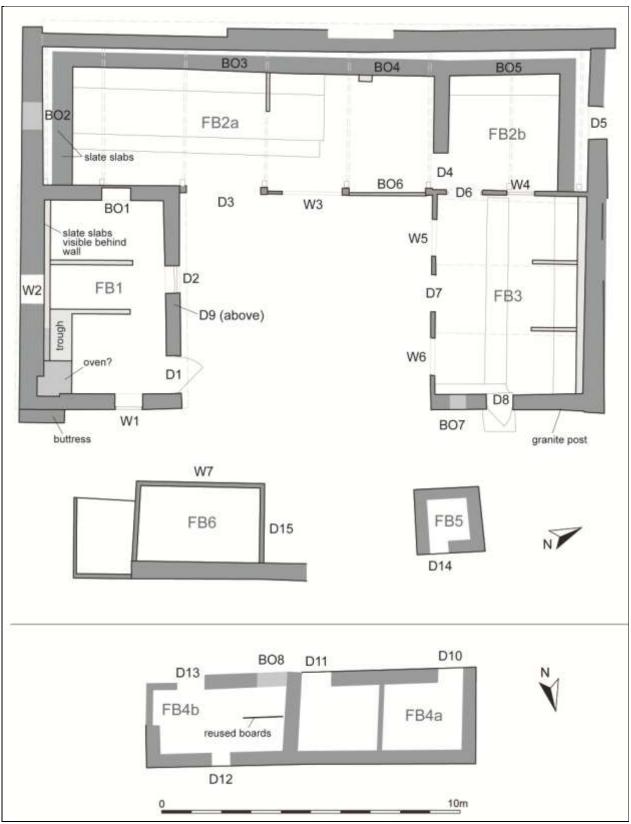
GROUND-FLOOR PLAN OF THE FARM BUILDINGS (FB), SHOWING DOORS (DX), WINDOWS (WX) AND BLOCKED OPENINGS (BOX) (BASED ON SUPPLIED DRAWINGS).
